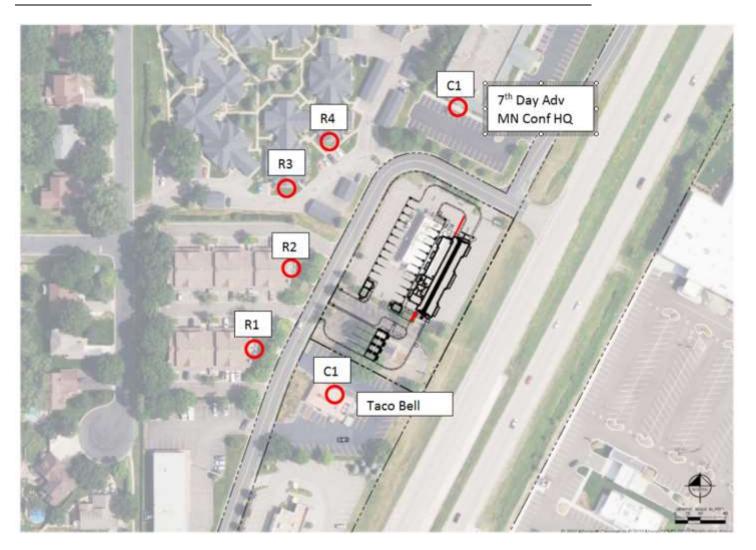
PROPOSED NOISE WALLS RELATIVE TO RECEPTOR SITES
